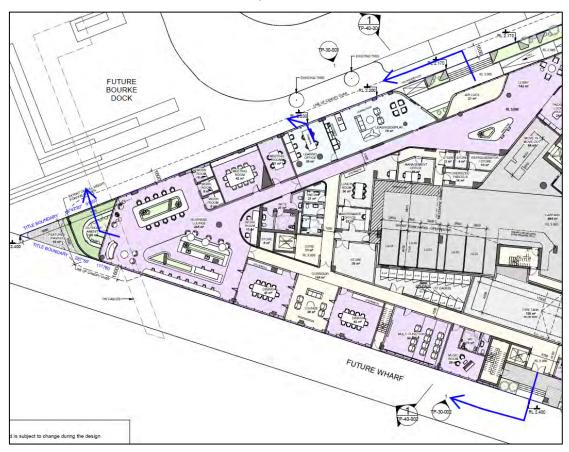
extract of the proposed ground floor plan (TP-21-000) with proposed and potential (from the leasing office) connections to Bourke Dock park
